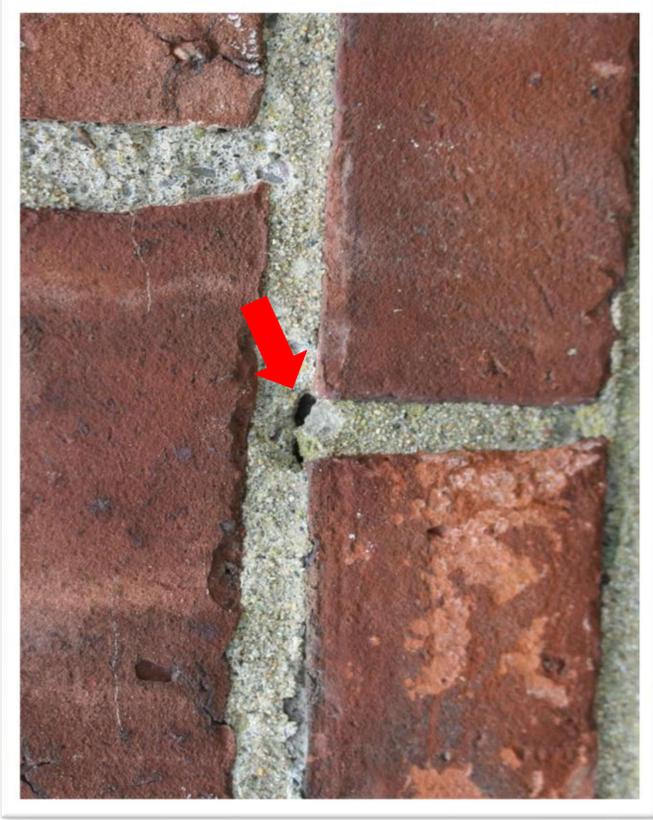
Small holes and voids in brick mortar observed throughout historic facade.
